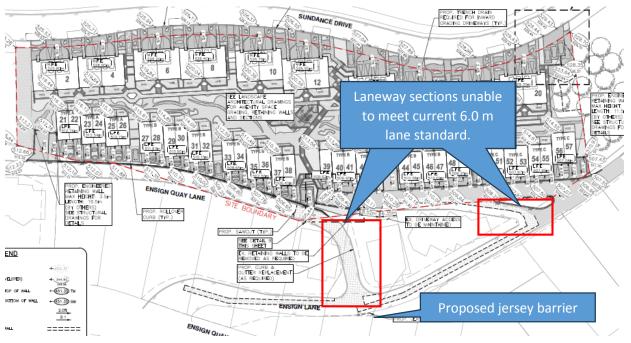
laneway improvements (i.e., widening and safety barrier)
